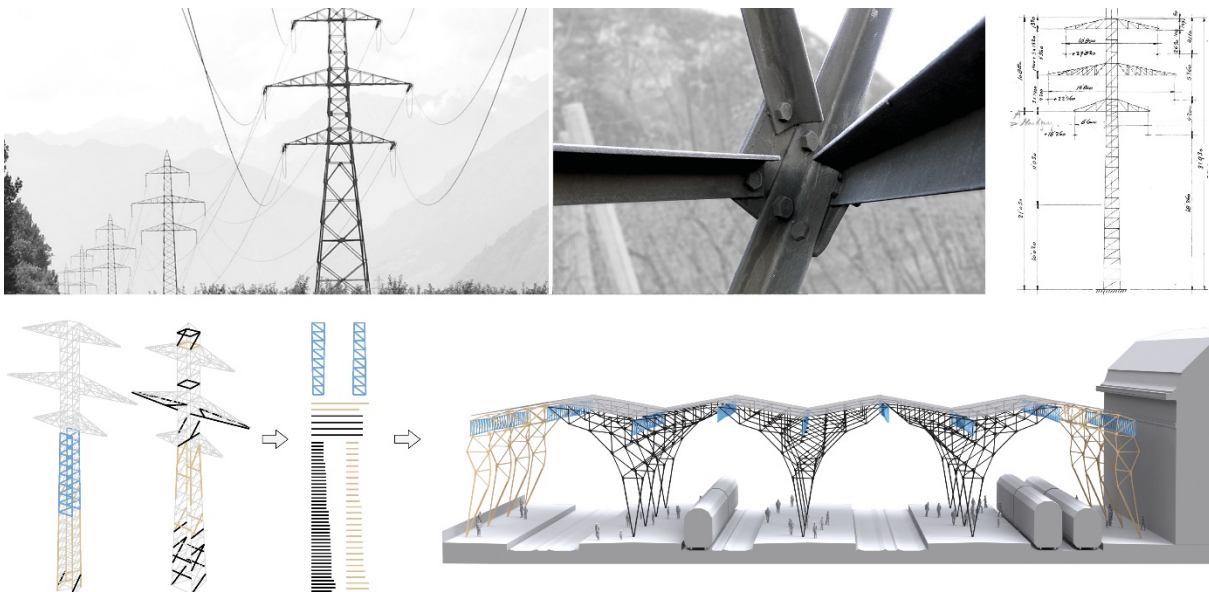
Schematic view of a train station roof truss made of electric pylon parts, after layout optimization³⁸. Top row images courtesy of Swissgrid.
